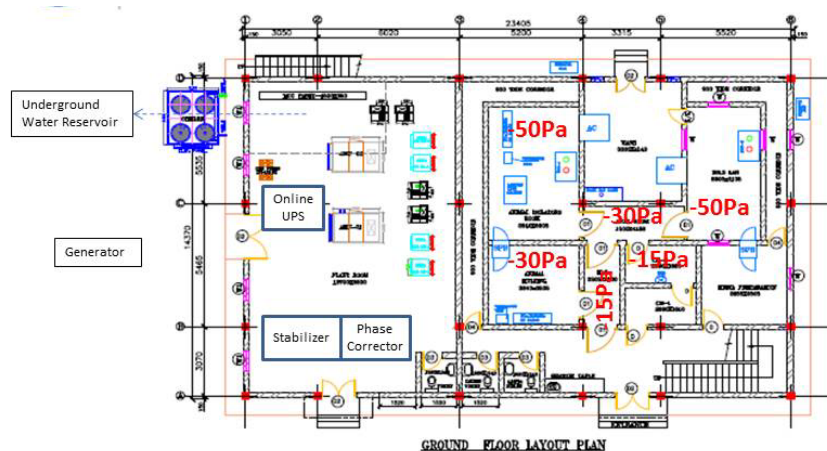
Layout of Biocontainment facility (BSL-3 lab and animal house) at the school of Biotechnology in New Delhia Facility.
